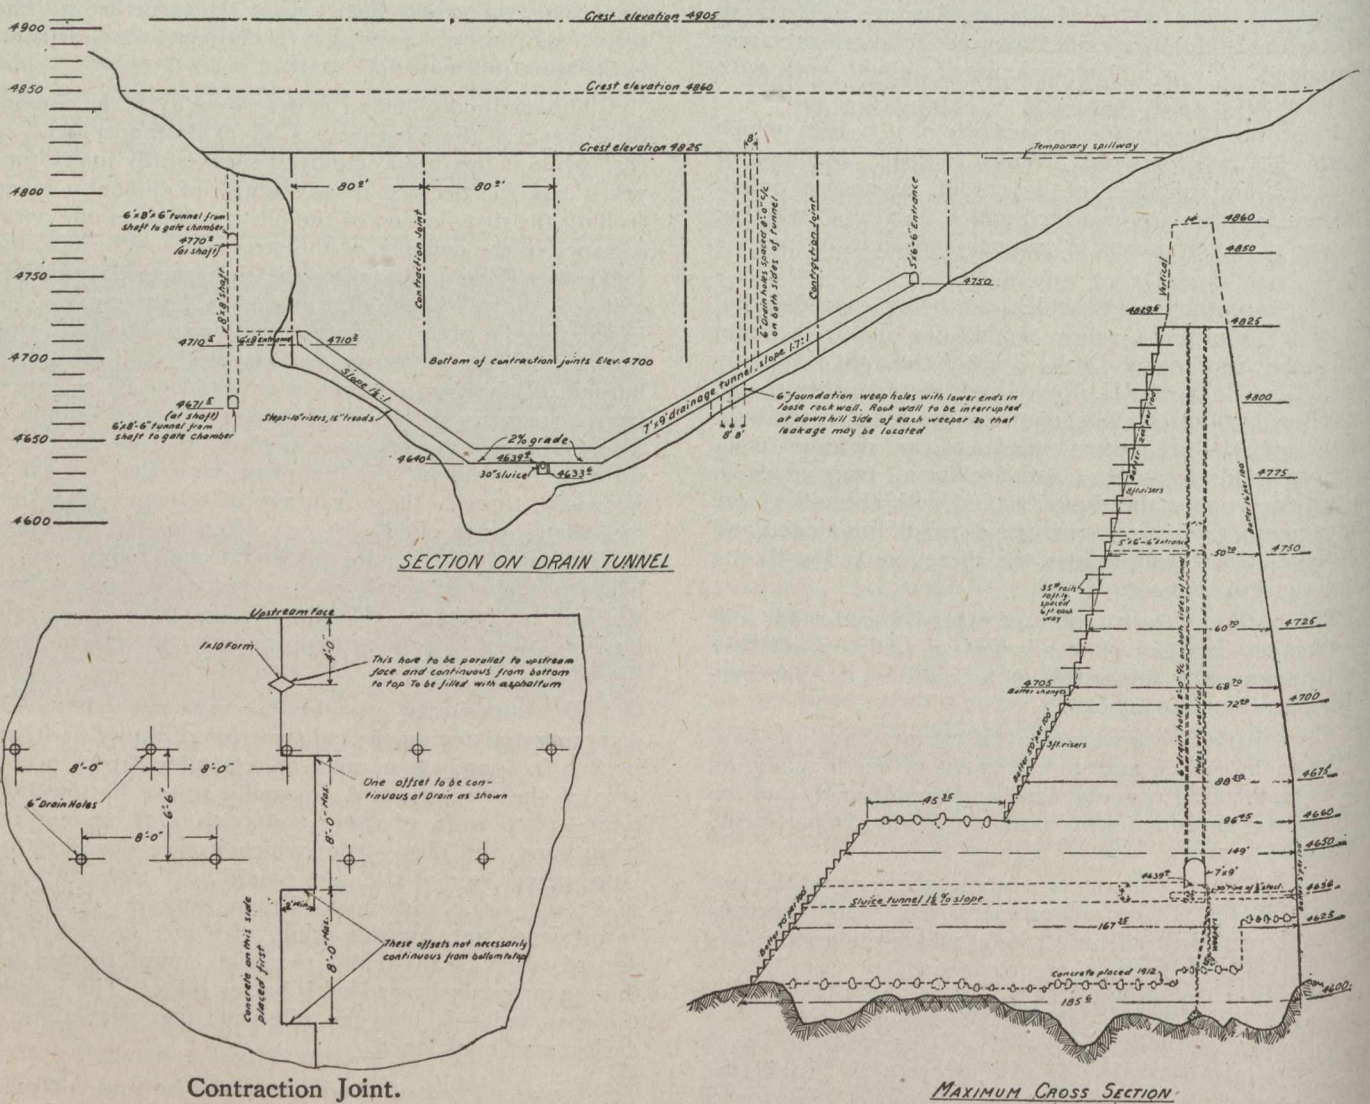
Sections of 225-foot Lake Spaulding Dam.
